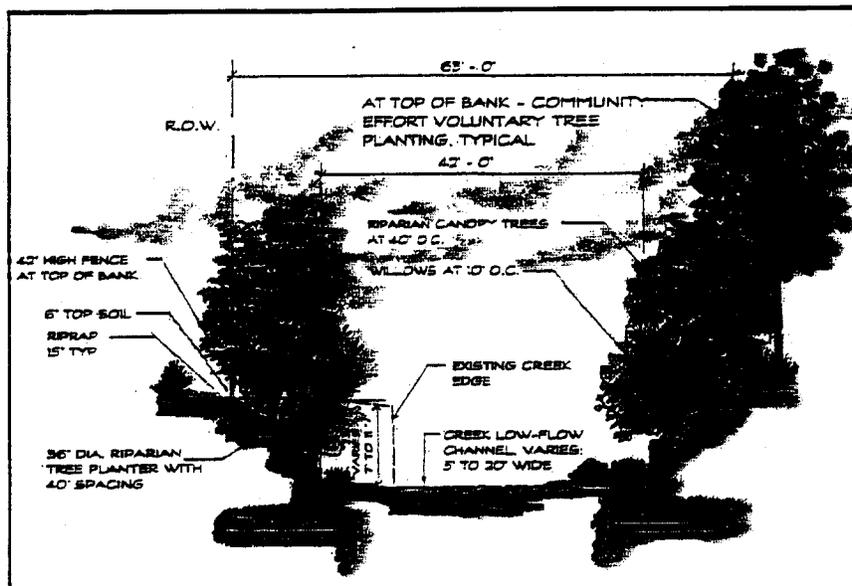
Vegetated Riprap Sideslope on Inverted "T" Footing Typical Section
